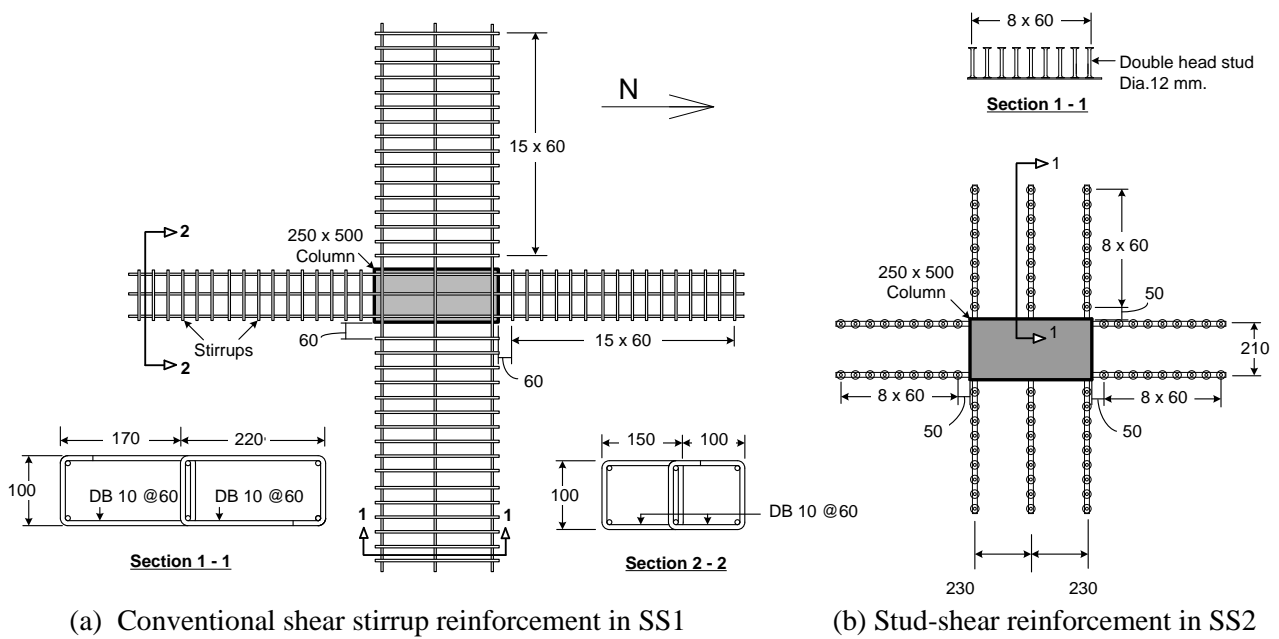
Details of shear reinforcement in PT slabs and column reinforcement of the test specimens
